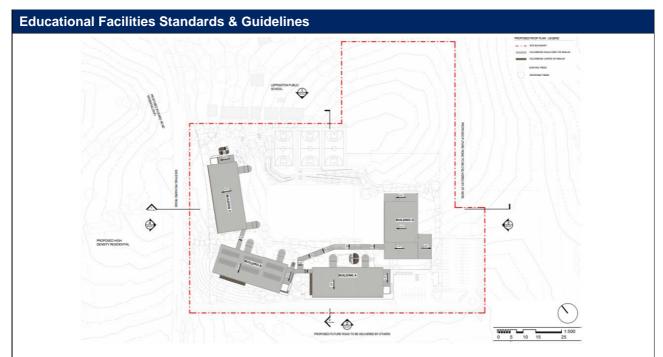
Proposed roof plan showing location of photovoltaic panels (Source: DJRD)
